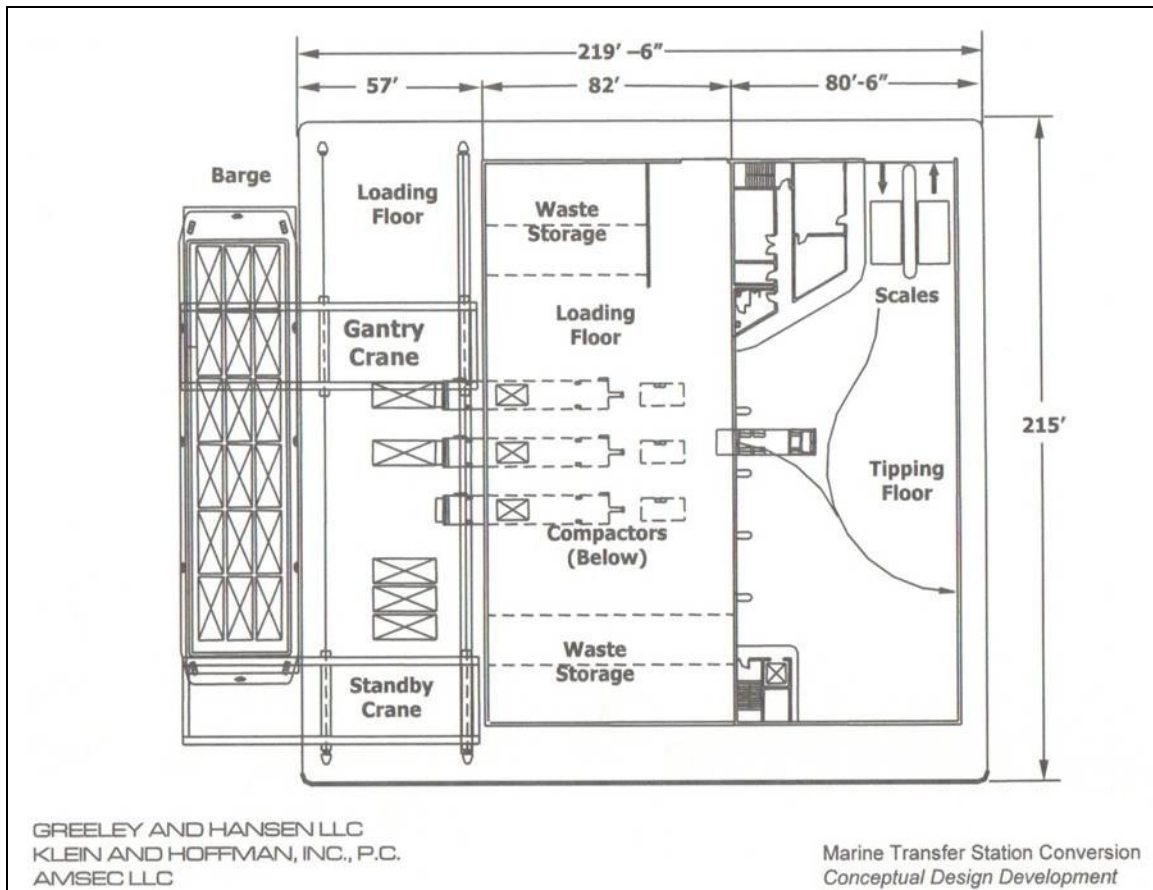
Plan of proposed MTS⁽¹⁰⁾.
